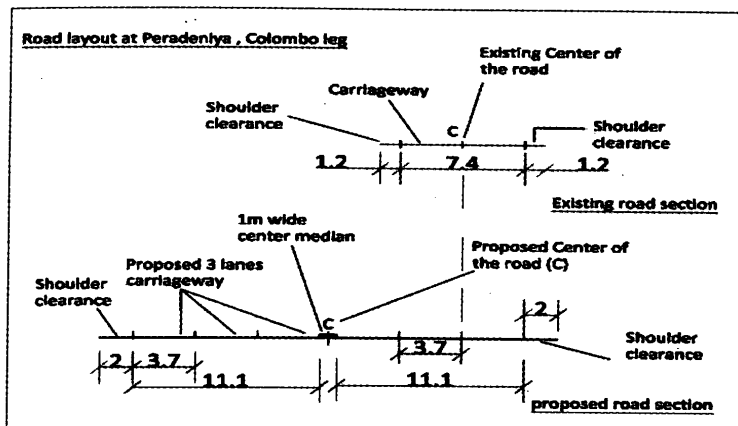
Geometric details of existing and proposed road sections for Colombo leg
